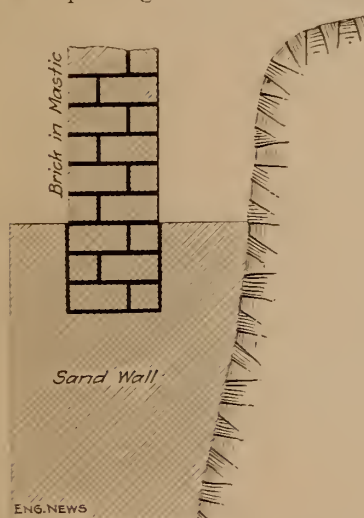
EXAMPLE OF WATER-PROOFING STRUCTURE IN ROCK WITH BRICK WALL LAID IN MASTIC
